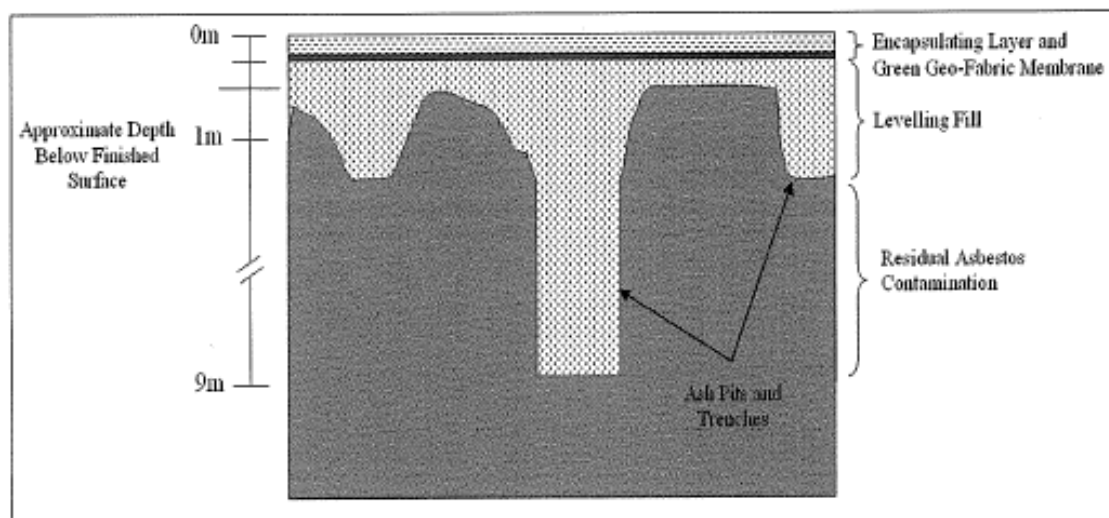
Typical Profile of Capping Layer – Area 16, Power Station Portion of Site
